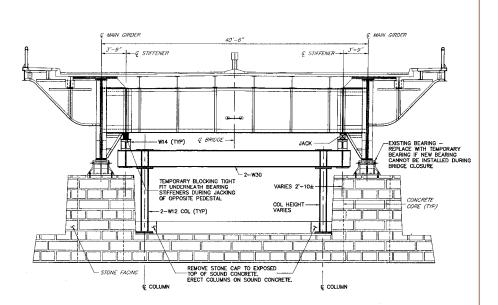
Suggested jacking scheme for the main span girder bearings.
